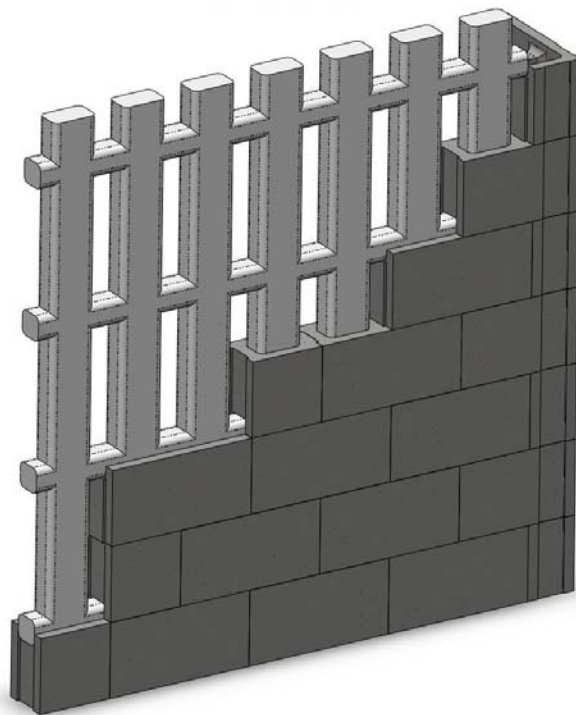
Cross-sectional view of the refined masonry system exposing the concrete core.
